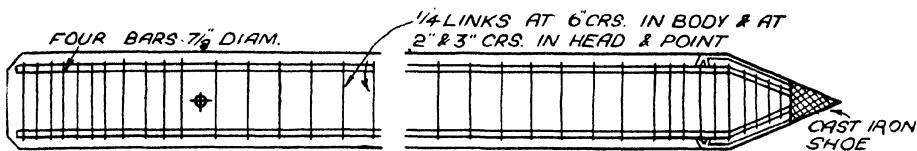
14-in. by 14-in. reinforced-concrete pile, 30 ft. long
